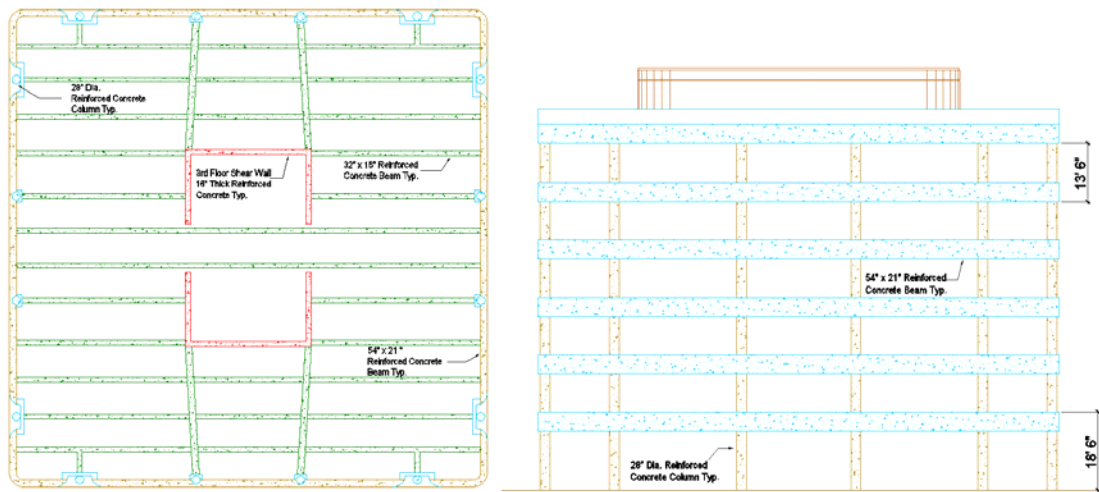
Typical floor framing plan and exterior framing elevation illustrating the main structural systems
